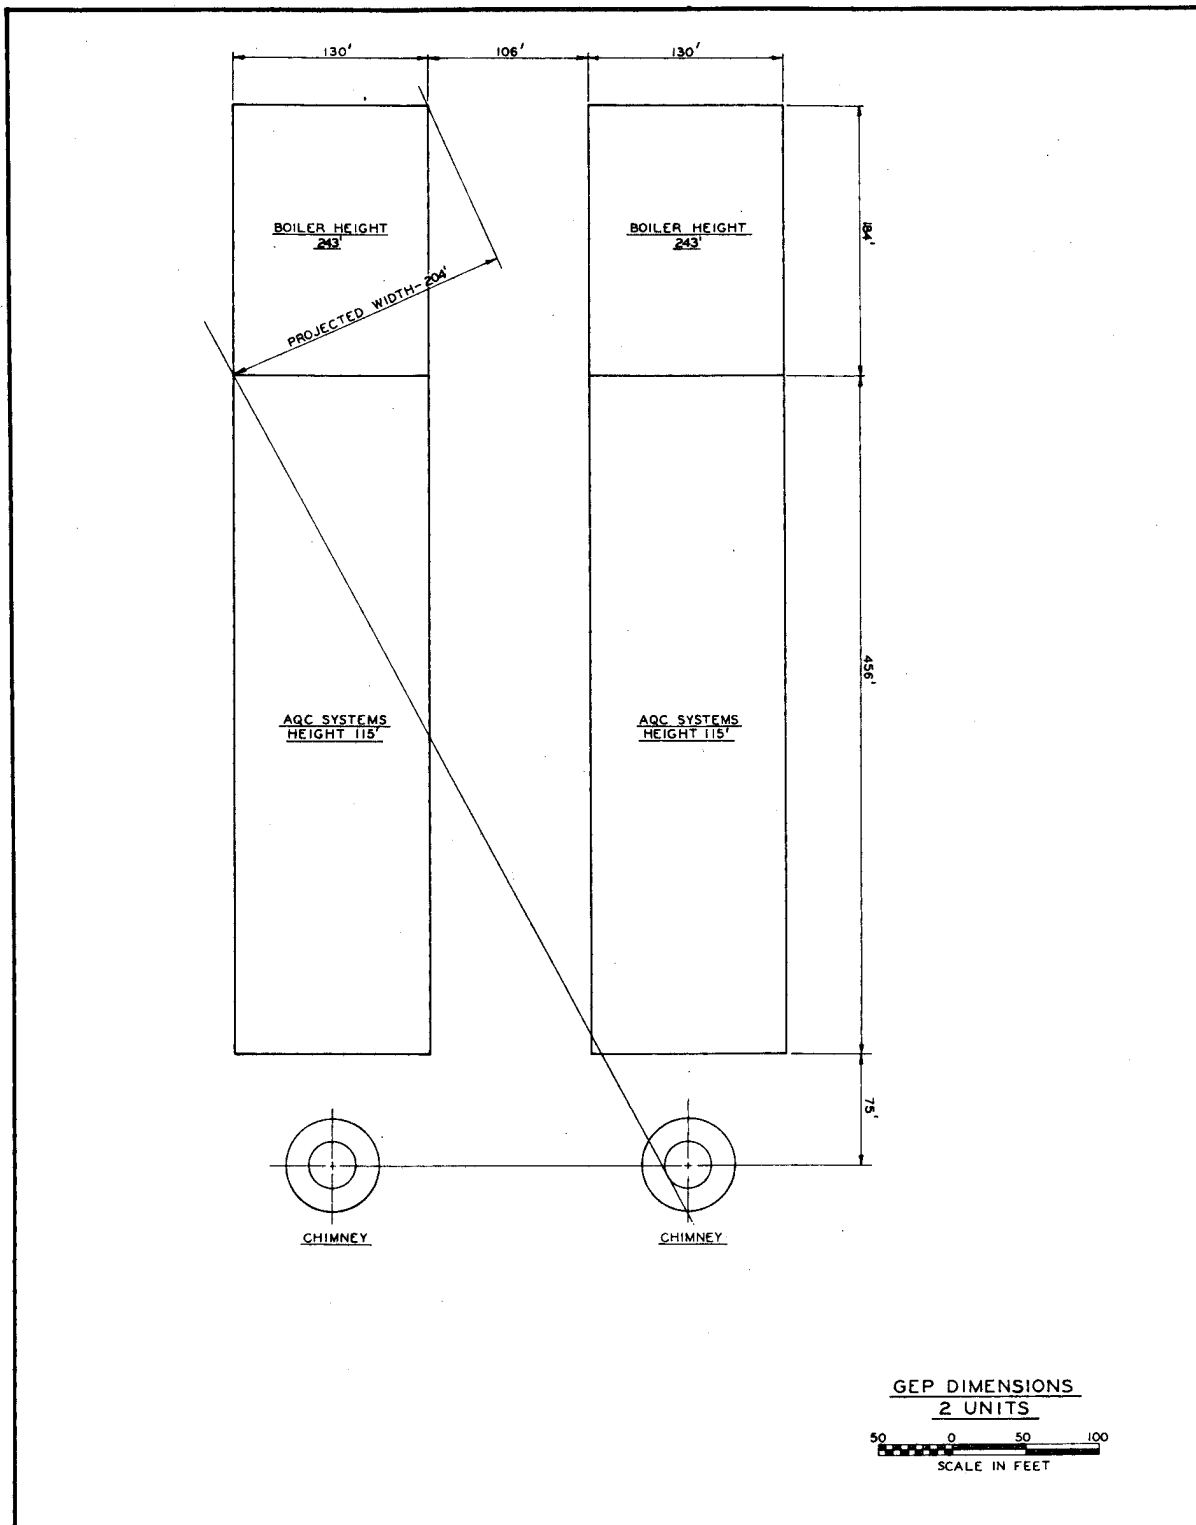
A-2. BUILDING LAYOUT FOR
